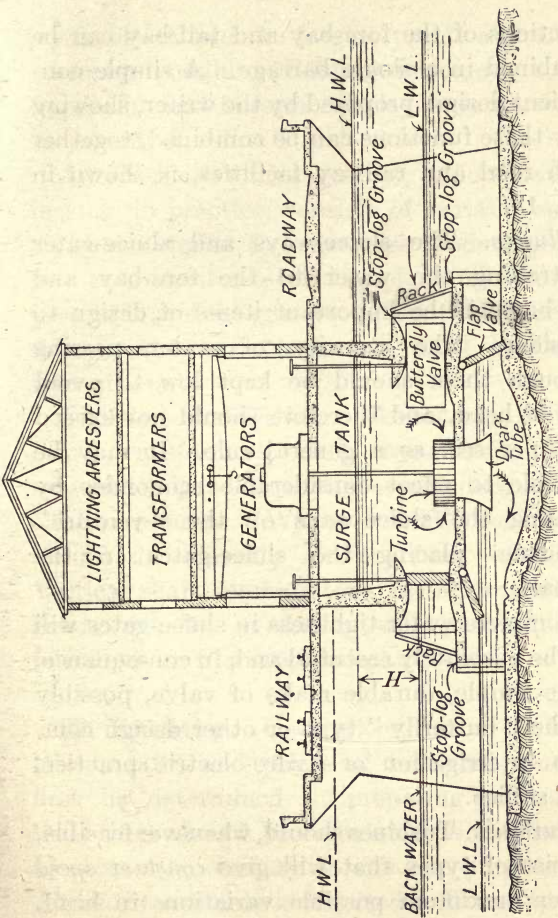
SECTION THROUGH PROPOSED BARRAGE AND POWER HOUSE FOR SINGLE BASIN SYSTEM
